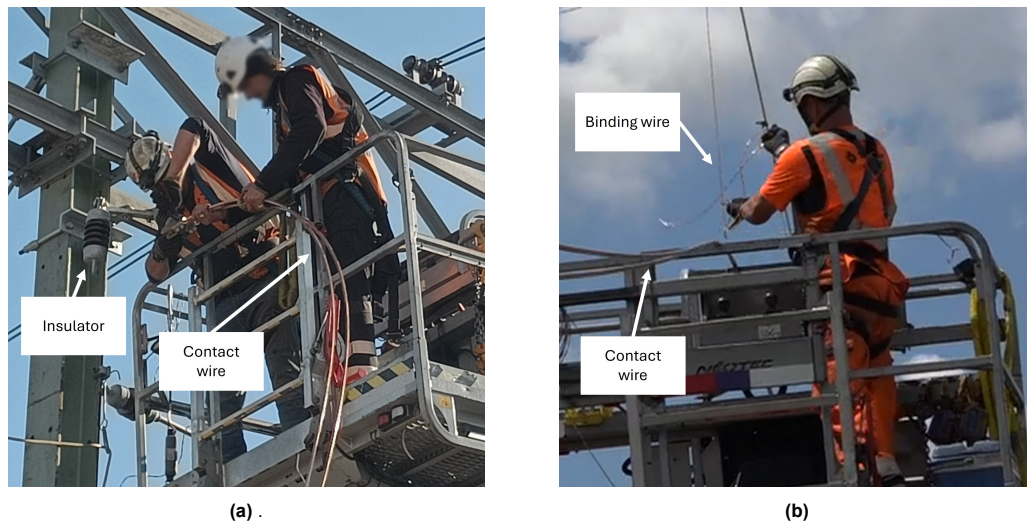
a) The process of connecting the contact wire to one of the poles. Clamps are installed on the binding wire and the binding wire is connected to the insulator, that is attached to the pole. b) The process of putting the binding wires on the contact wire. As the boom lift moves, the worker wraps the binding wires around the contact wire to hold the contact wire up.
